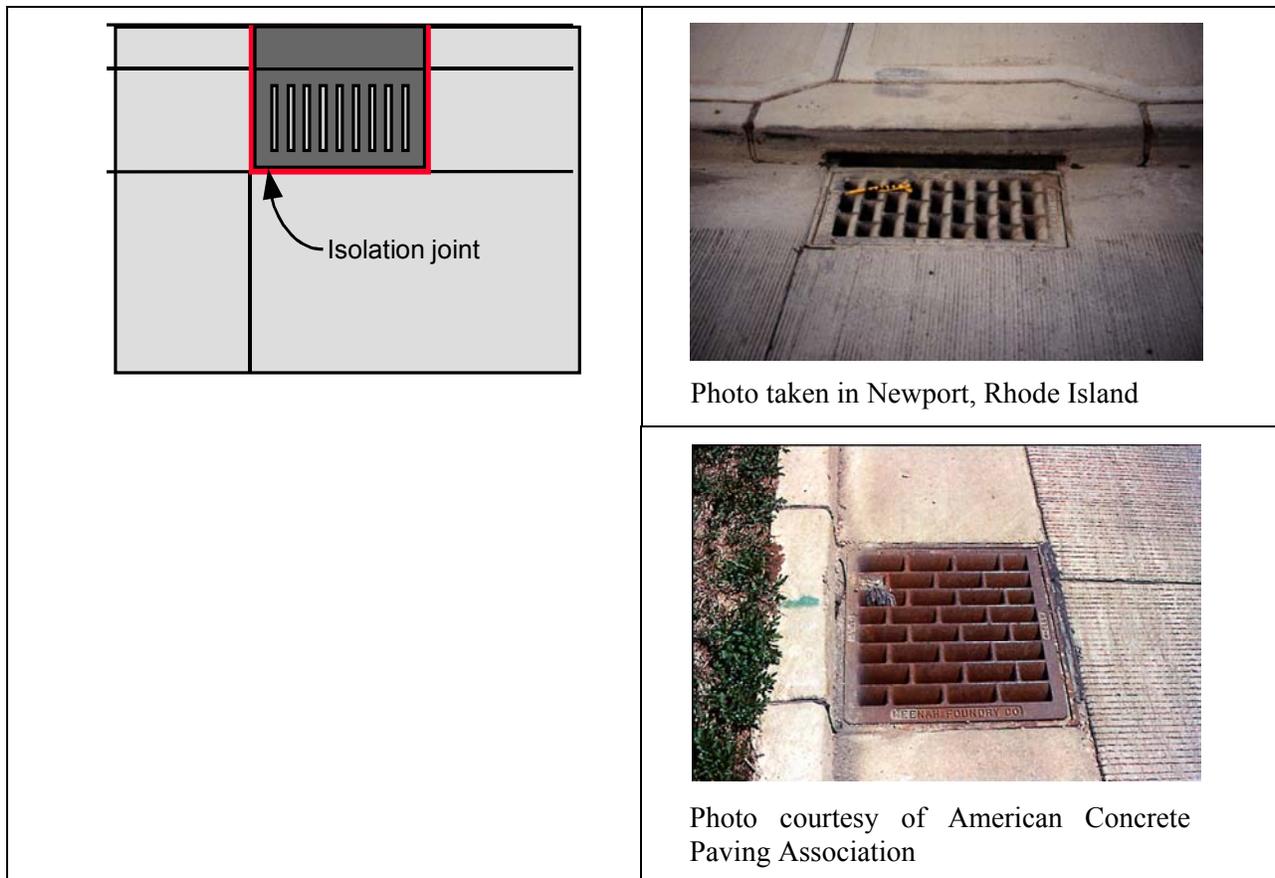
Inlet requiring only an isolation joint (figure courtesy of American Concrete Paving Association).
